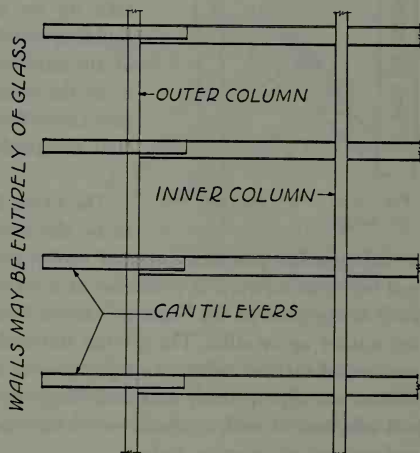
Use of internal columns and extending cantilevers in modern steel construction.
